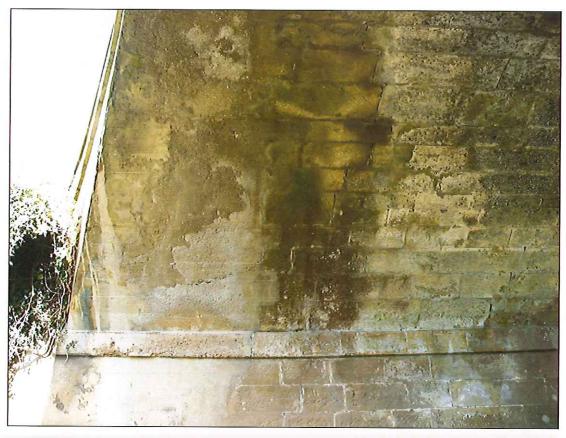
Concrete widening #5 to eastern downstream side of south span.
